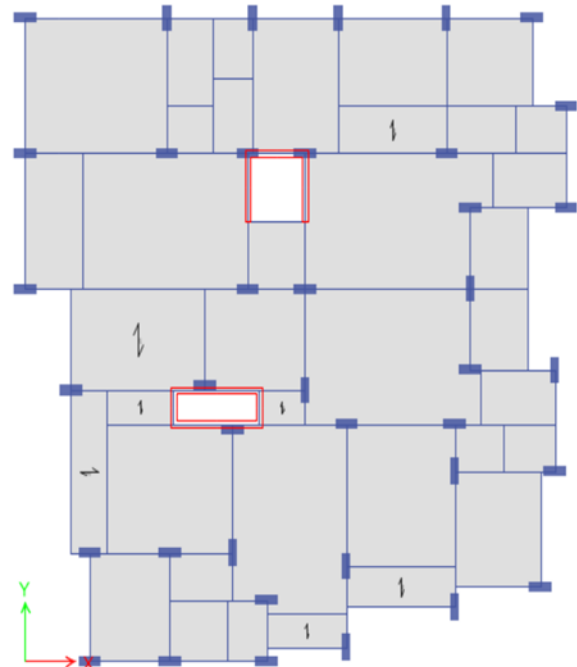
Plan of building with shear wall at Fire Duct-Lift.
